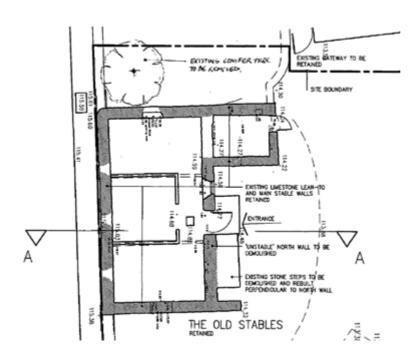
The Old Stables Manor Farm Existing Ground Floor Plan
